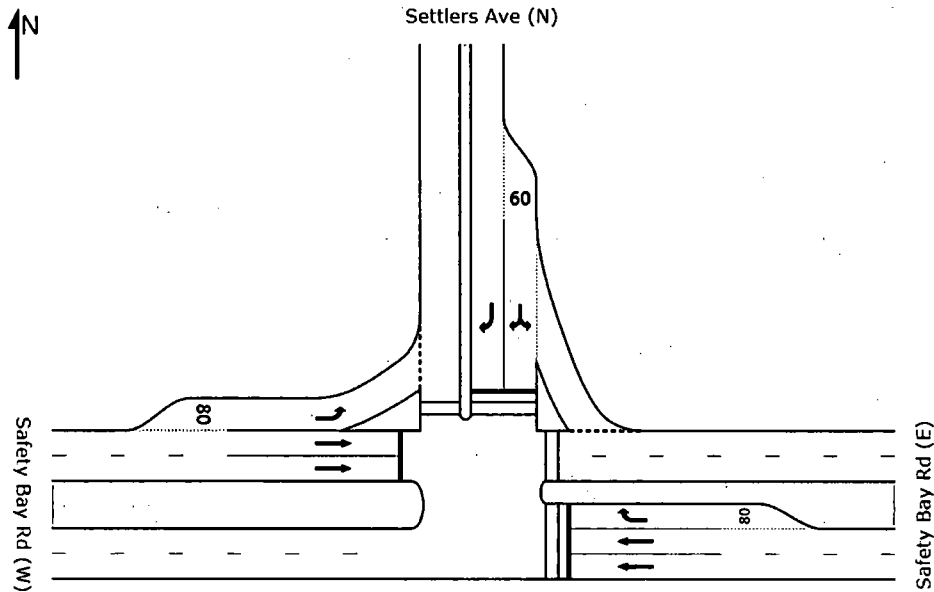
Safety Bay Road / Settlers Ave (3-way) intersection proposed layout
